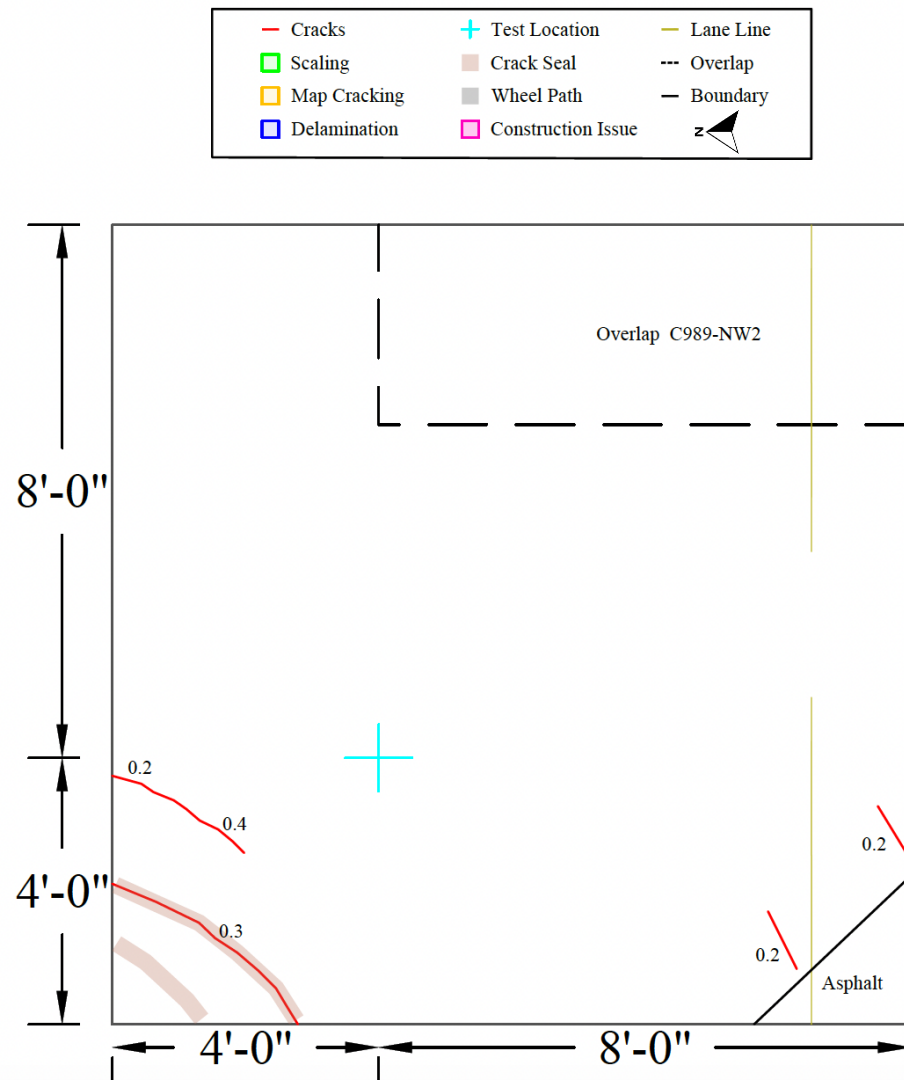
Test location 1 of normal-weight concrete approach slabs at bridge C-989.
